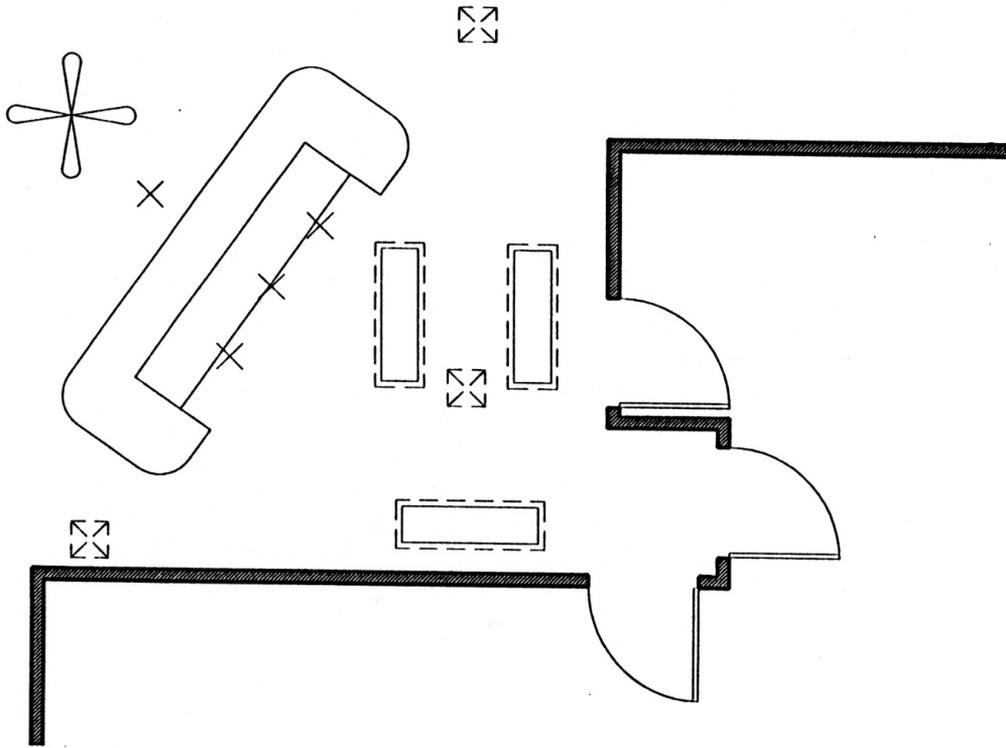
Plan of Assisted Living Work Area - Site 1.
